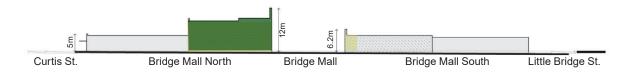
Built form test of street wall, setback and upper level heights- Section C
